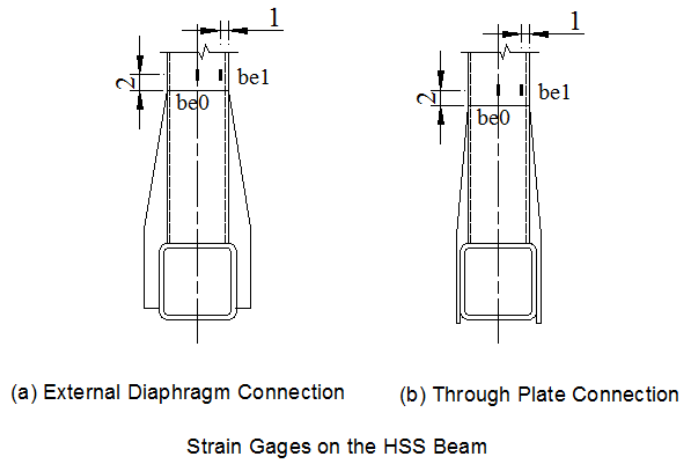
Strain Gage Layout for the Two Reinforced Connections (units in inch)
